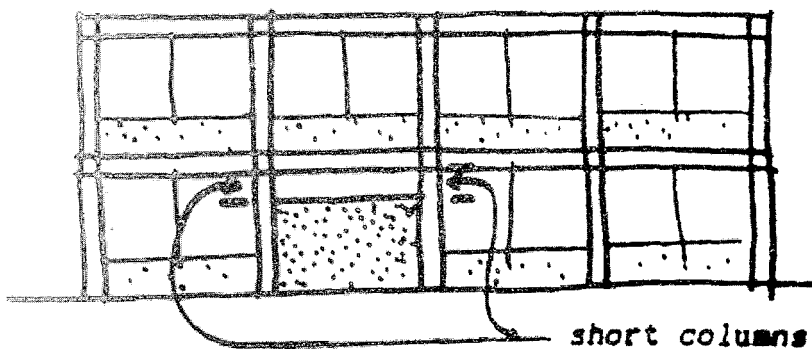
Nonstructural infill creates short columns that attract earthquake forces
